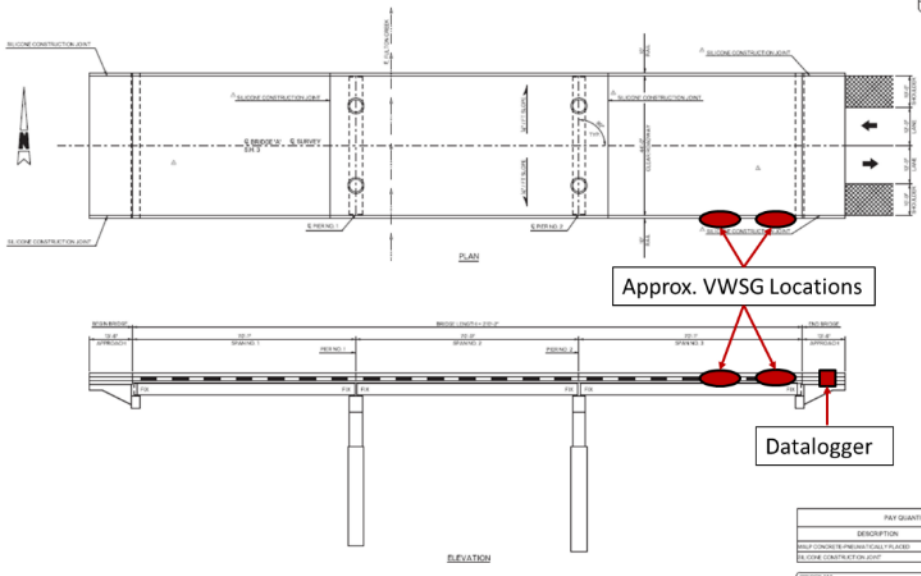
Approximate location of vibrating wire strain gauges for monitoring temperature and shrinkage of MALP concrete repair on SH-3 over Fulton Creek bridge
